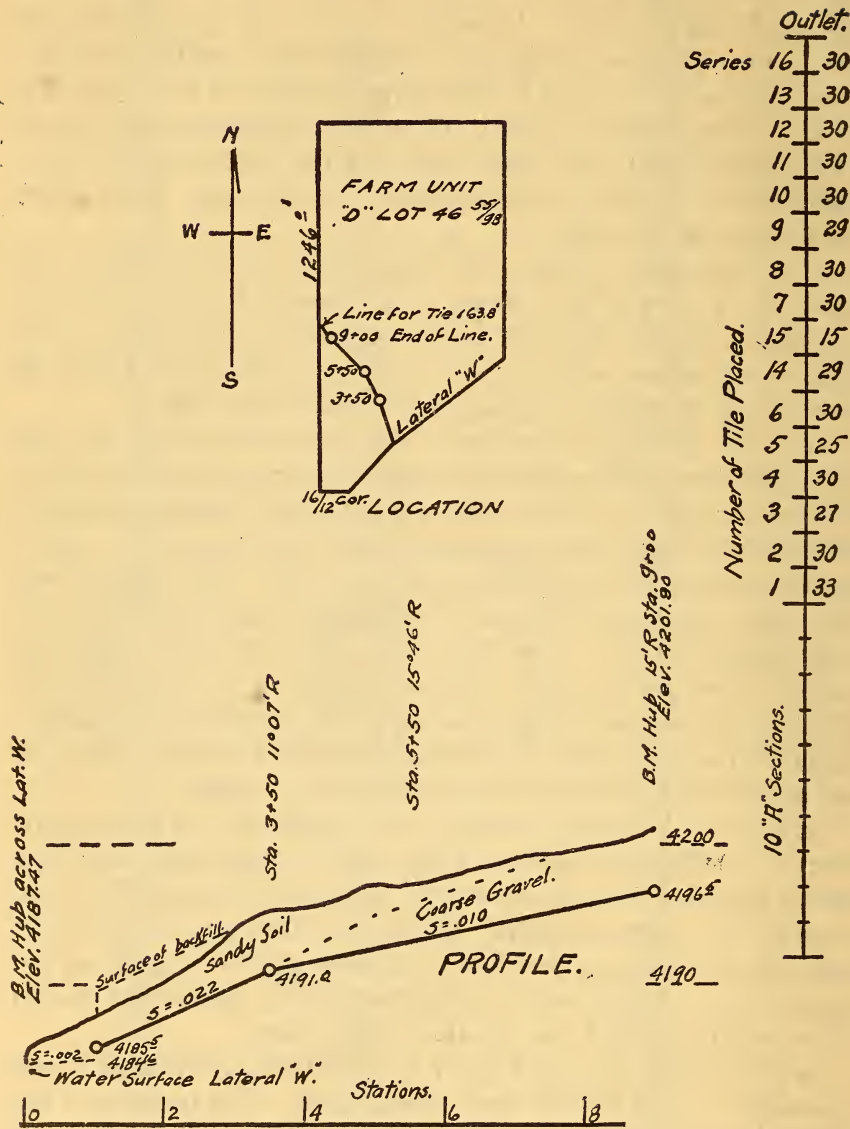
Showing location, plan, profile, and arrangement of experimental drain tile at Garland, Wyo.
